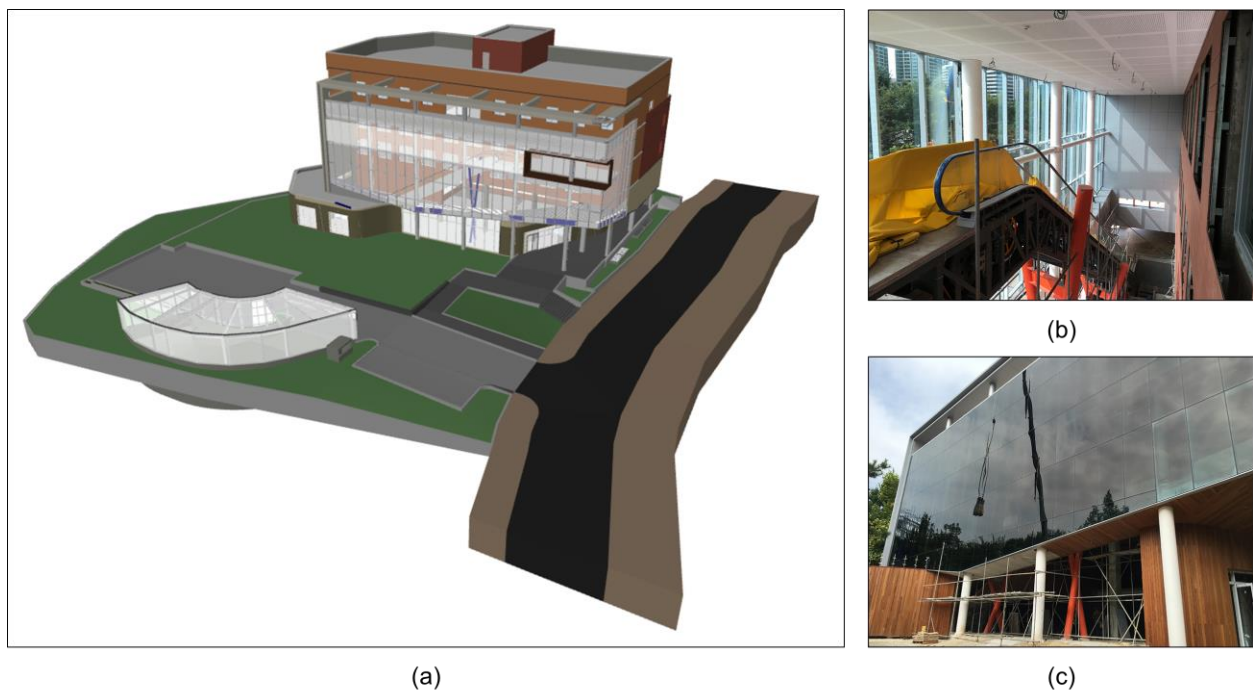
Daily 4D BIM model and as-built photos from August 9, 2016: (a) daily 4D BIM model; (b) inside as-built photo (escalator installation); (c) outside as-built photo (curtainwall installation)
